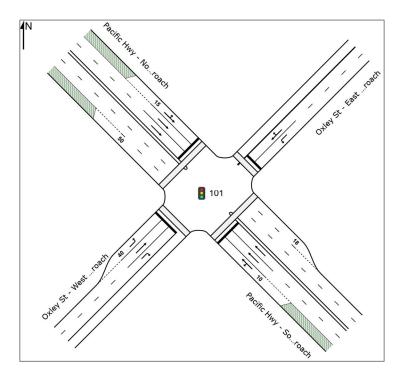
Intersection layout of Pacific Highway/Oxley Street intersection
